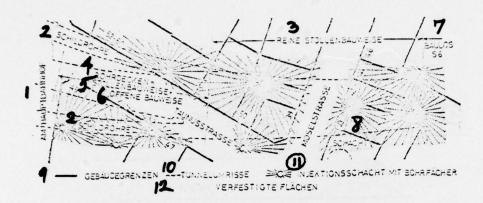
Construction Lot 5.2, Overview, Stabilization Zones With Drilling Fans.
